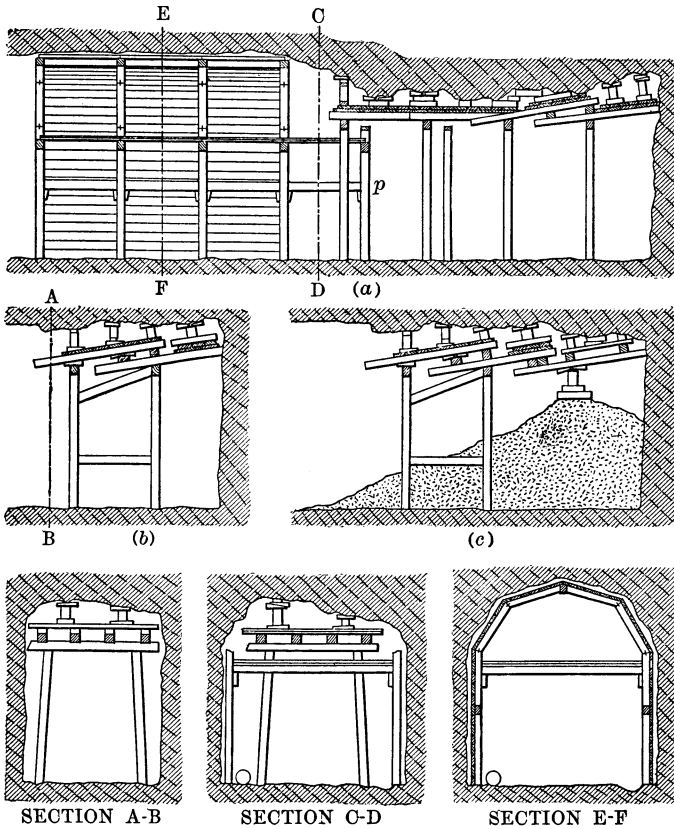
System of timbering used at the Elizabeth Lake Tunnel.
